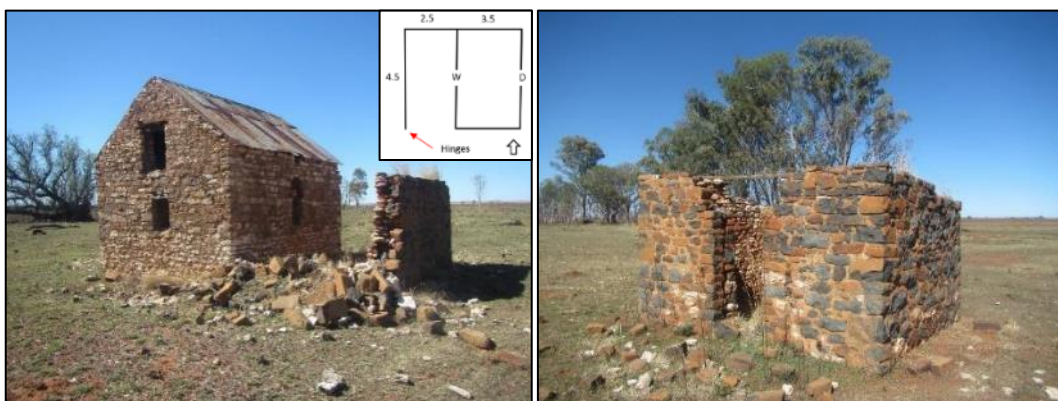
Examples of structures on site (source, ASHA, 2021)
